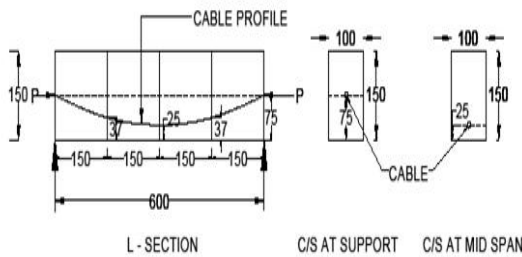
Cable profile and geometric details of Beam A1, B1, C1
